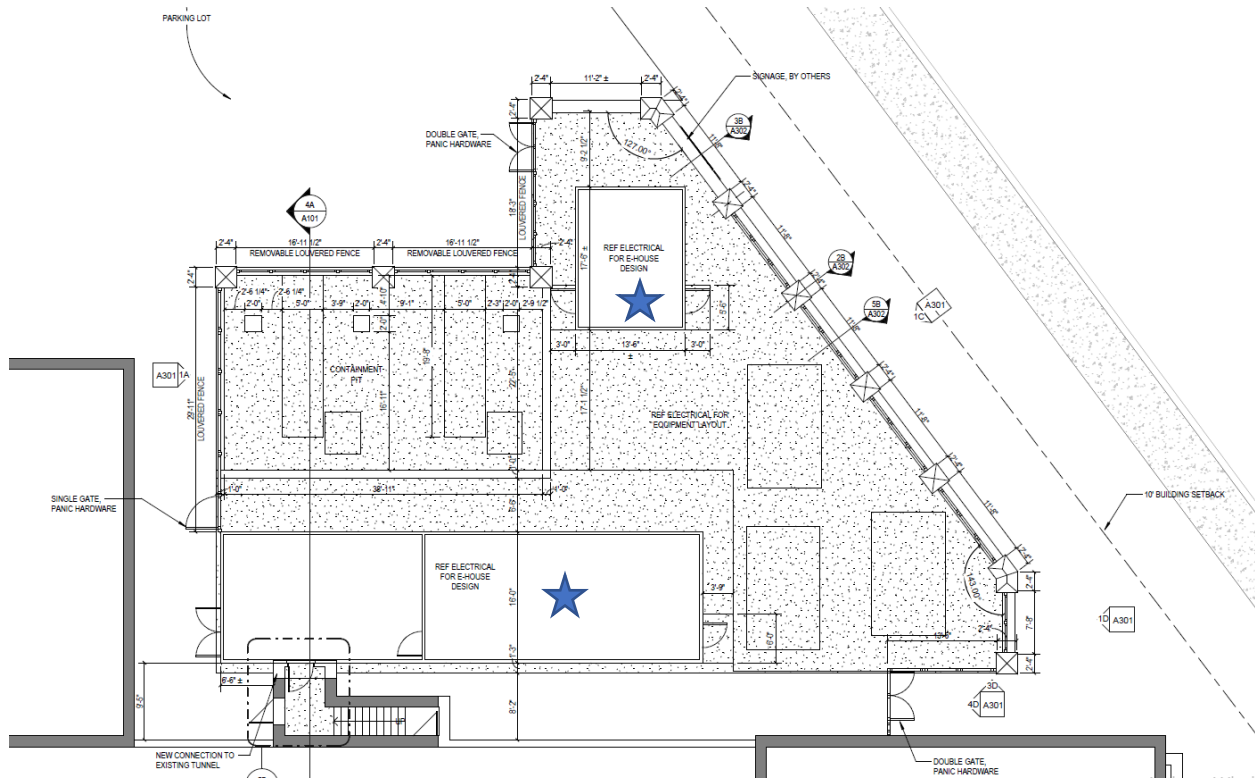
Substation plan showing proposed e-houses – Fuss & O’Neill 2021
